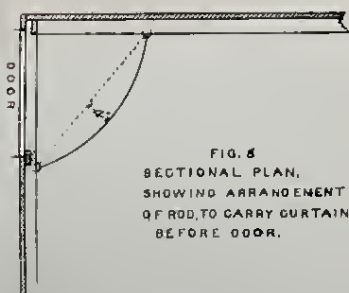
SECTIONAL PLAN, SHOWING ARRANGEMENT OF ROD TO CARRY CURTAIN BEFORE DOOR.
